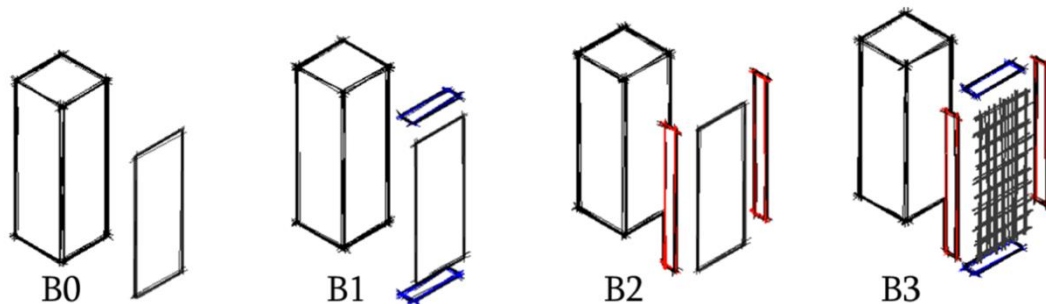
Sketch of the four side opening considered (from left to right B0, B1, B2, B3).
